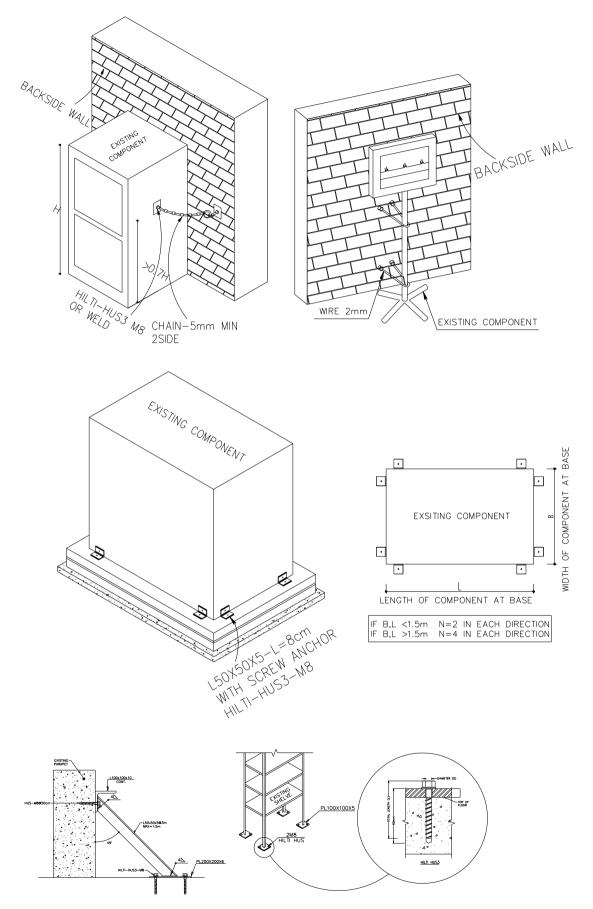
samples of provided retrofitting details drawing for non-structural elements
